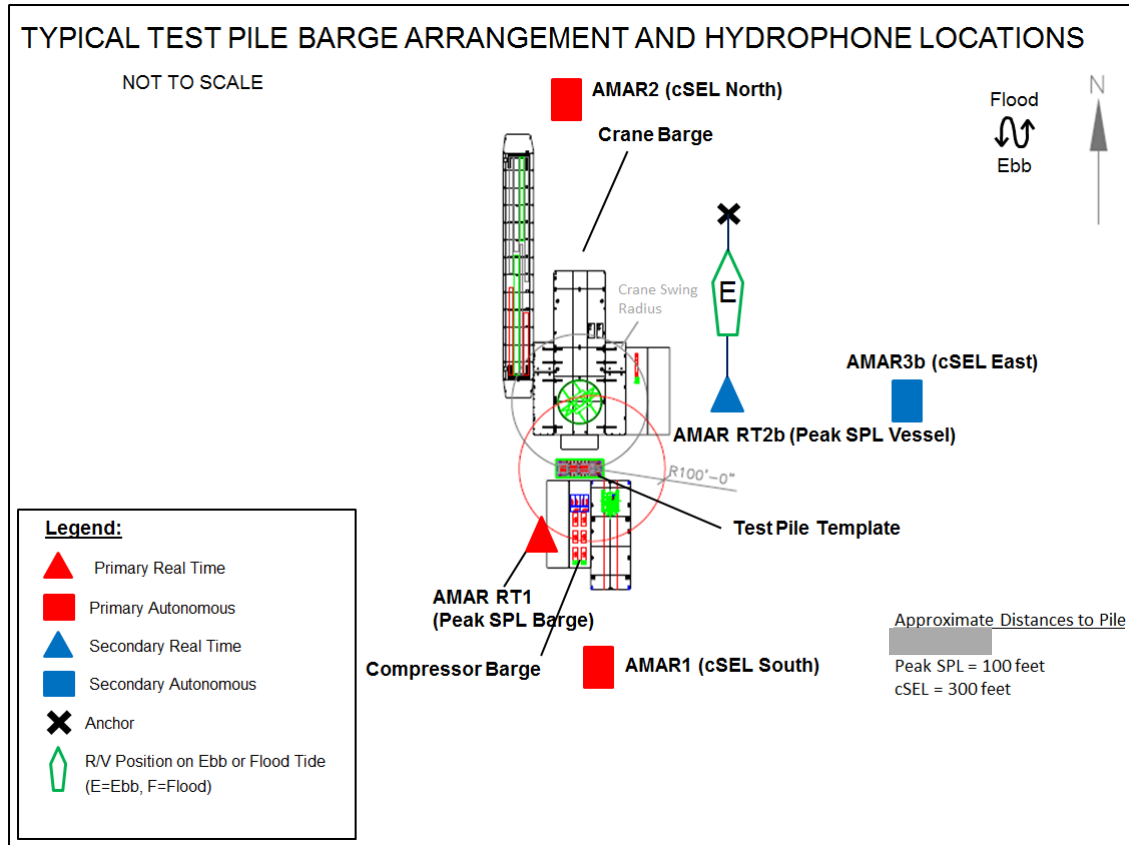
Plan view of pile and barge layout, 03 August 2013, PLT-112.
